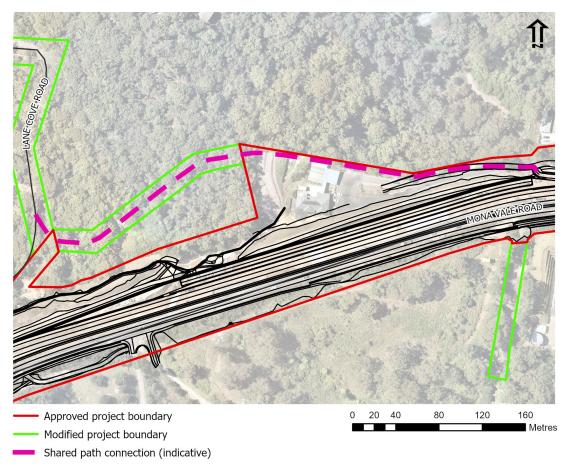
Shared path connection between Lane Cove Road and Walana Crescent
